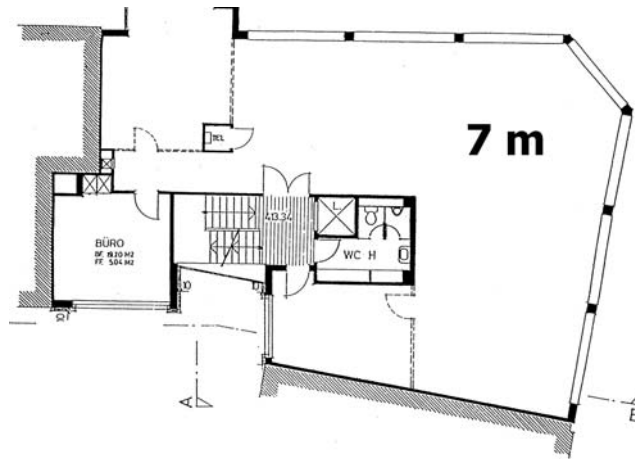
Plan view of the 1st and 2nd floors (cut above the slab and looking down on the slab).
